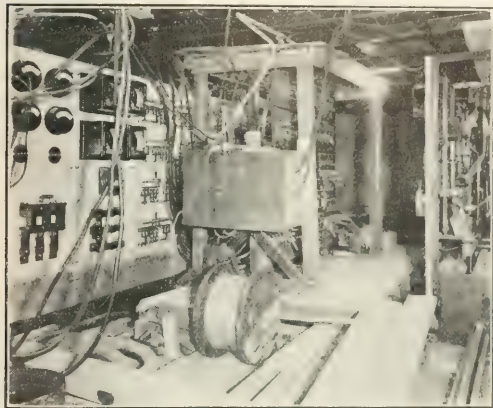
SWITCHBOARD ROOM; MAIN LIGHTING SWITCHBOARD AT LEFT, MAIN MOTOR SWITCHBOARD AT RIGHT AND TEMPORARY SWITCHBOARD IN CENTER
